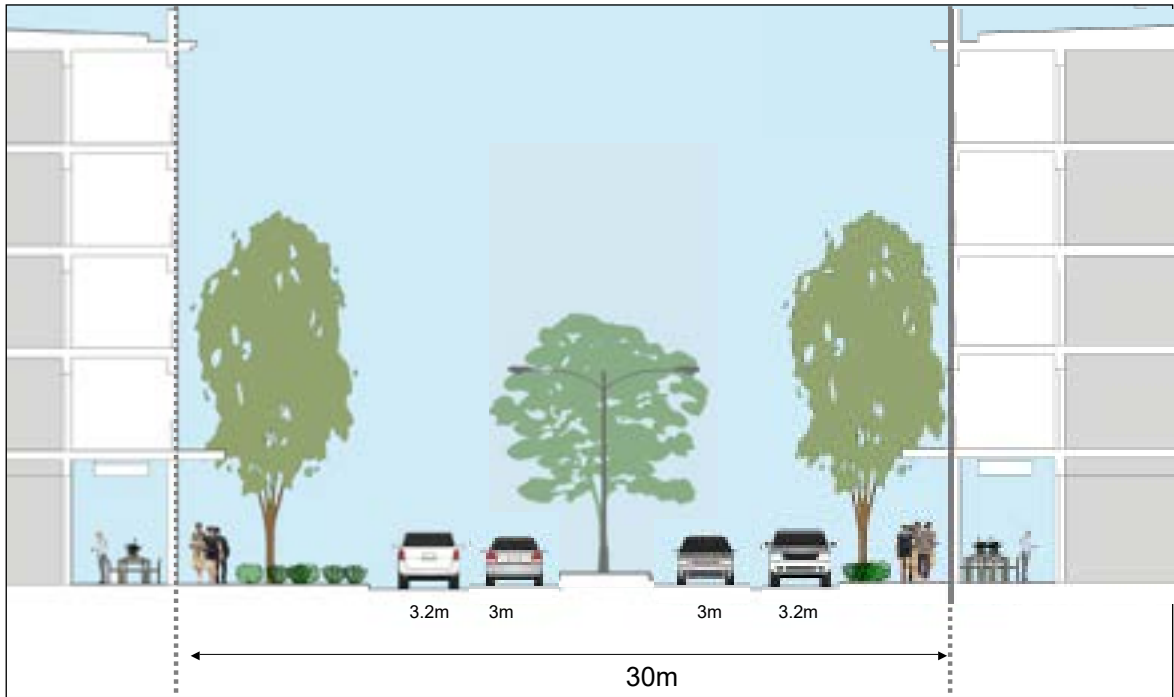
Street Type 3: Main Street between Eldorado Street and Hutton Street with long term peak bus lane and off-peak parking lane (30m)
